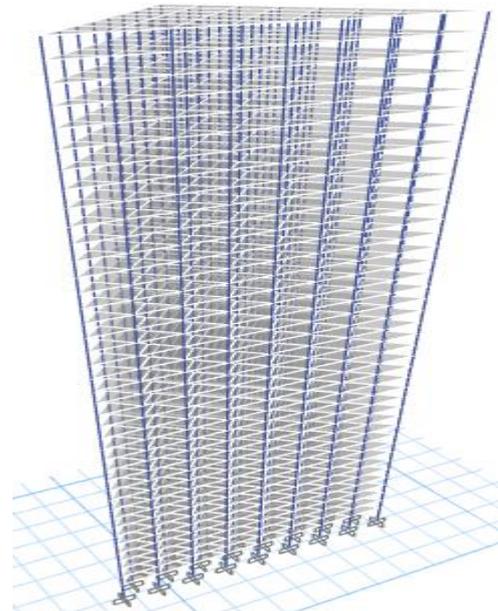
Elevation of G+40 Building with Conventional system without diagrid
